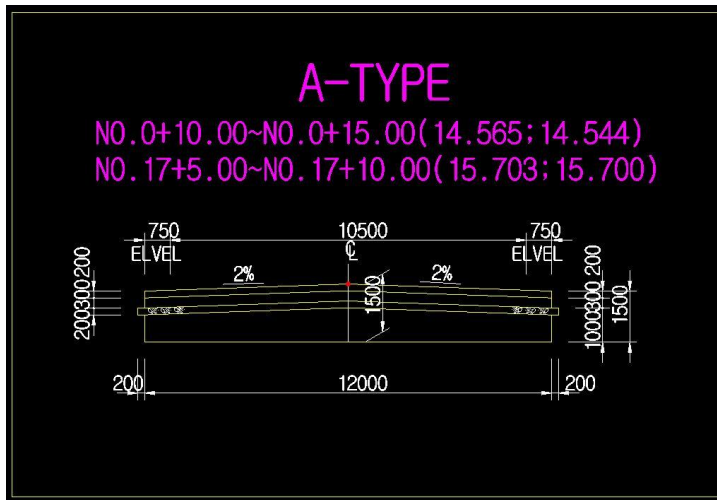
Character marking for the location and width of the cross-section of the underground road
